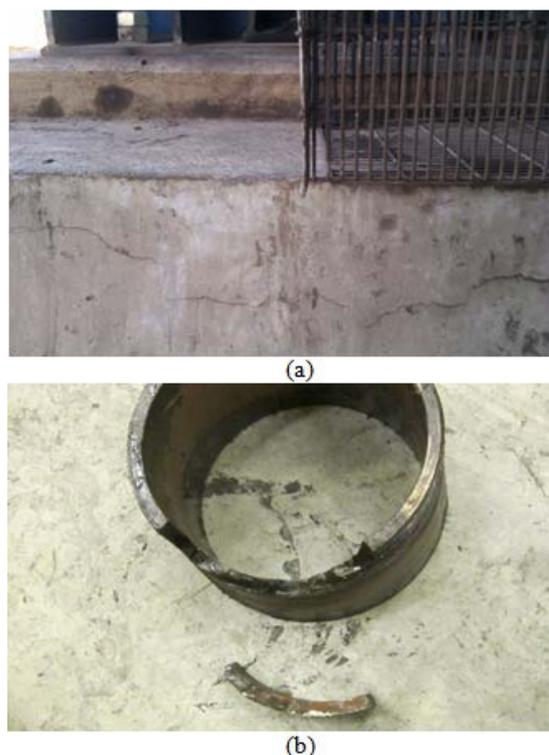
a) cracks in the foundation, b) damaged bearing case
